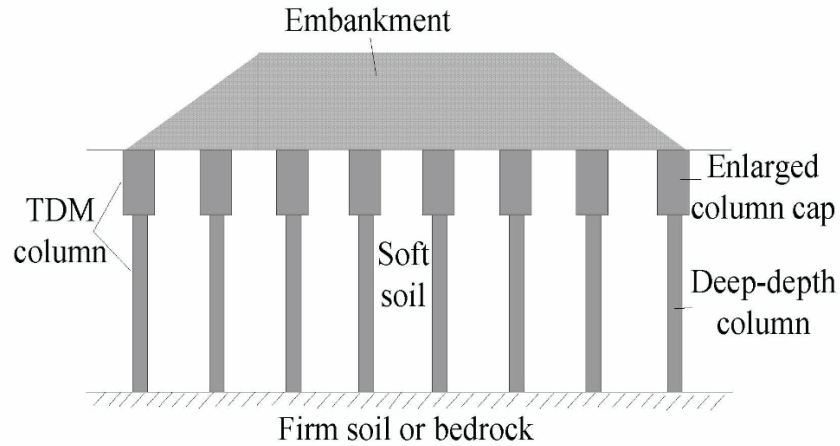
Embankment supported by T-shaped deep mixing column (TDM) (Liu, 2018)
